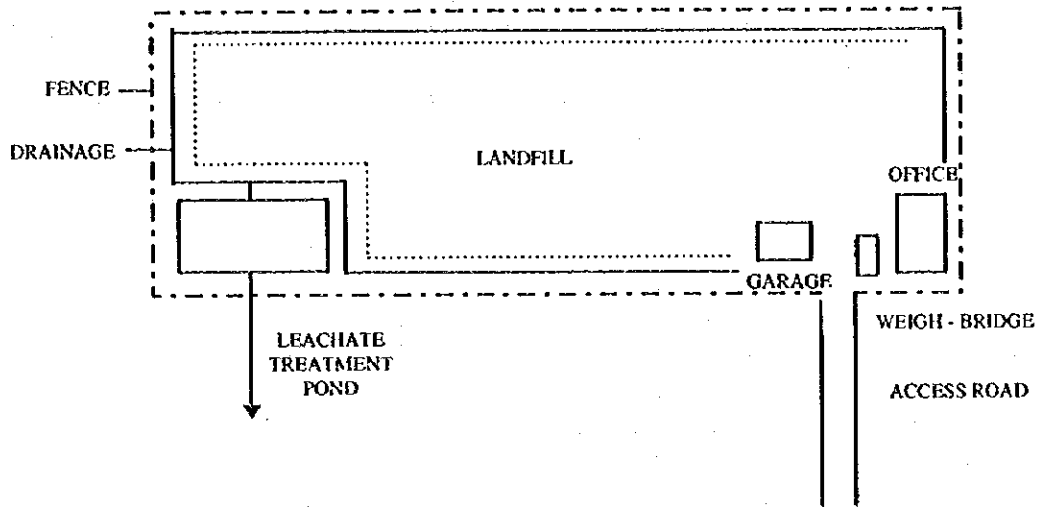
Schematic Plan of Sanitary Landfill Site
